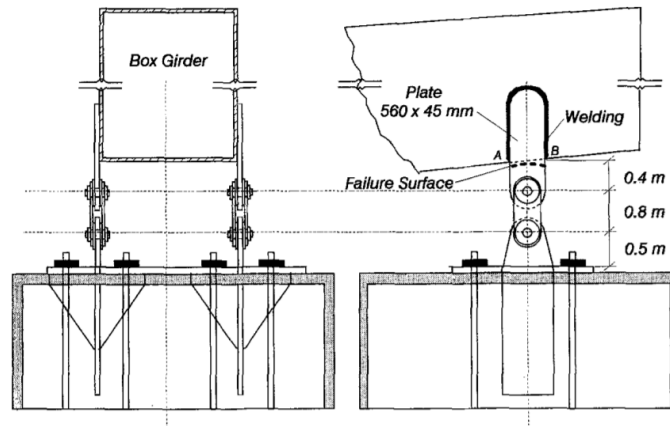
Tie-rod assembly at each box girder of Shipshaw abutment, adopted from (Filiatrault et al., 1993)
